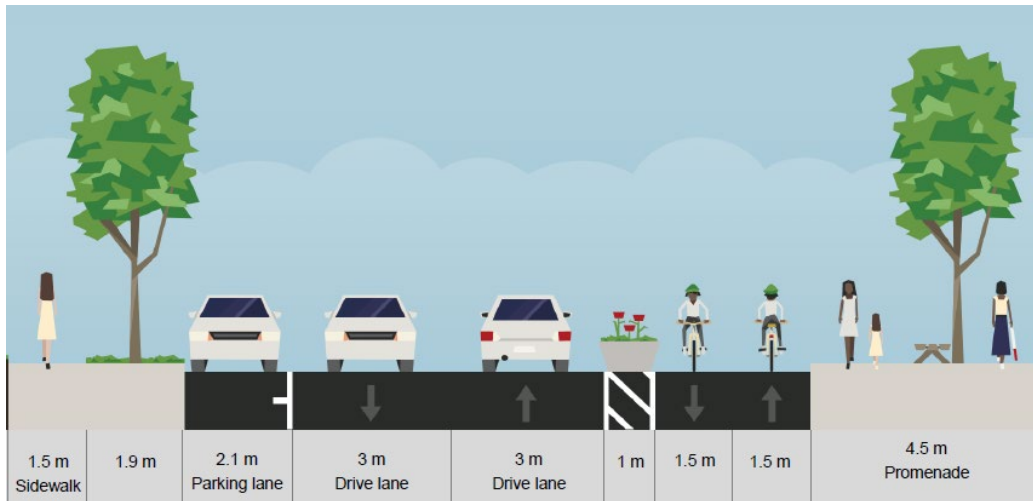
STREET DESIGN CONCEPT #4 - CONVENTIONAL MIXED-USE COLLECTOR STREET
